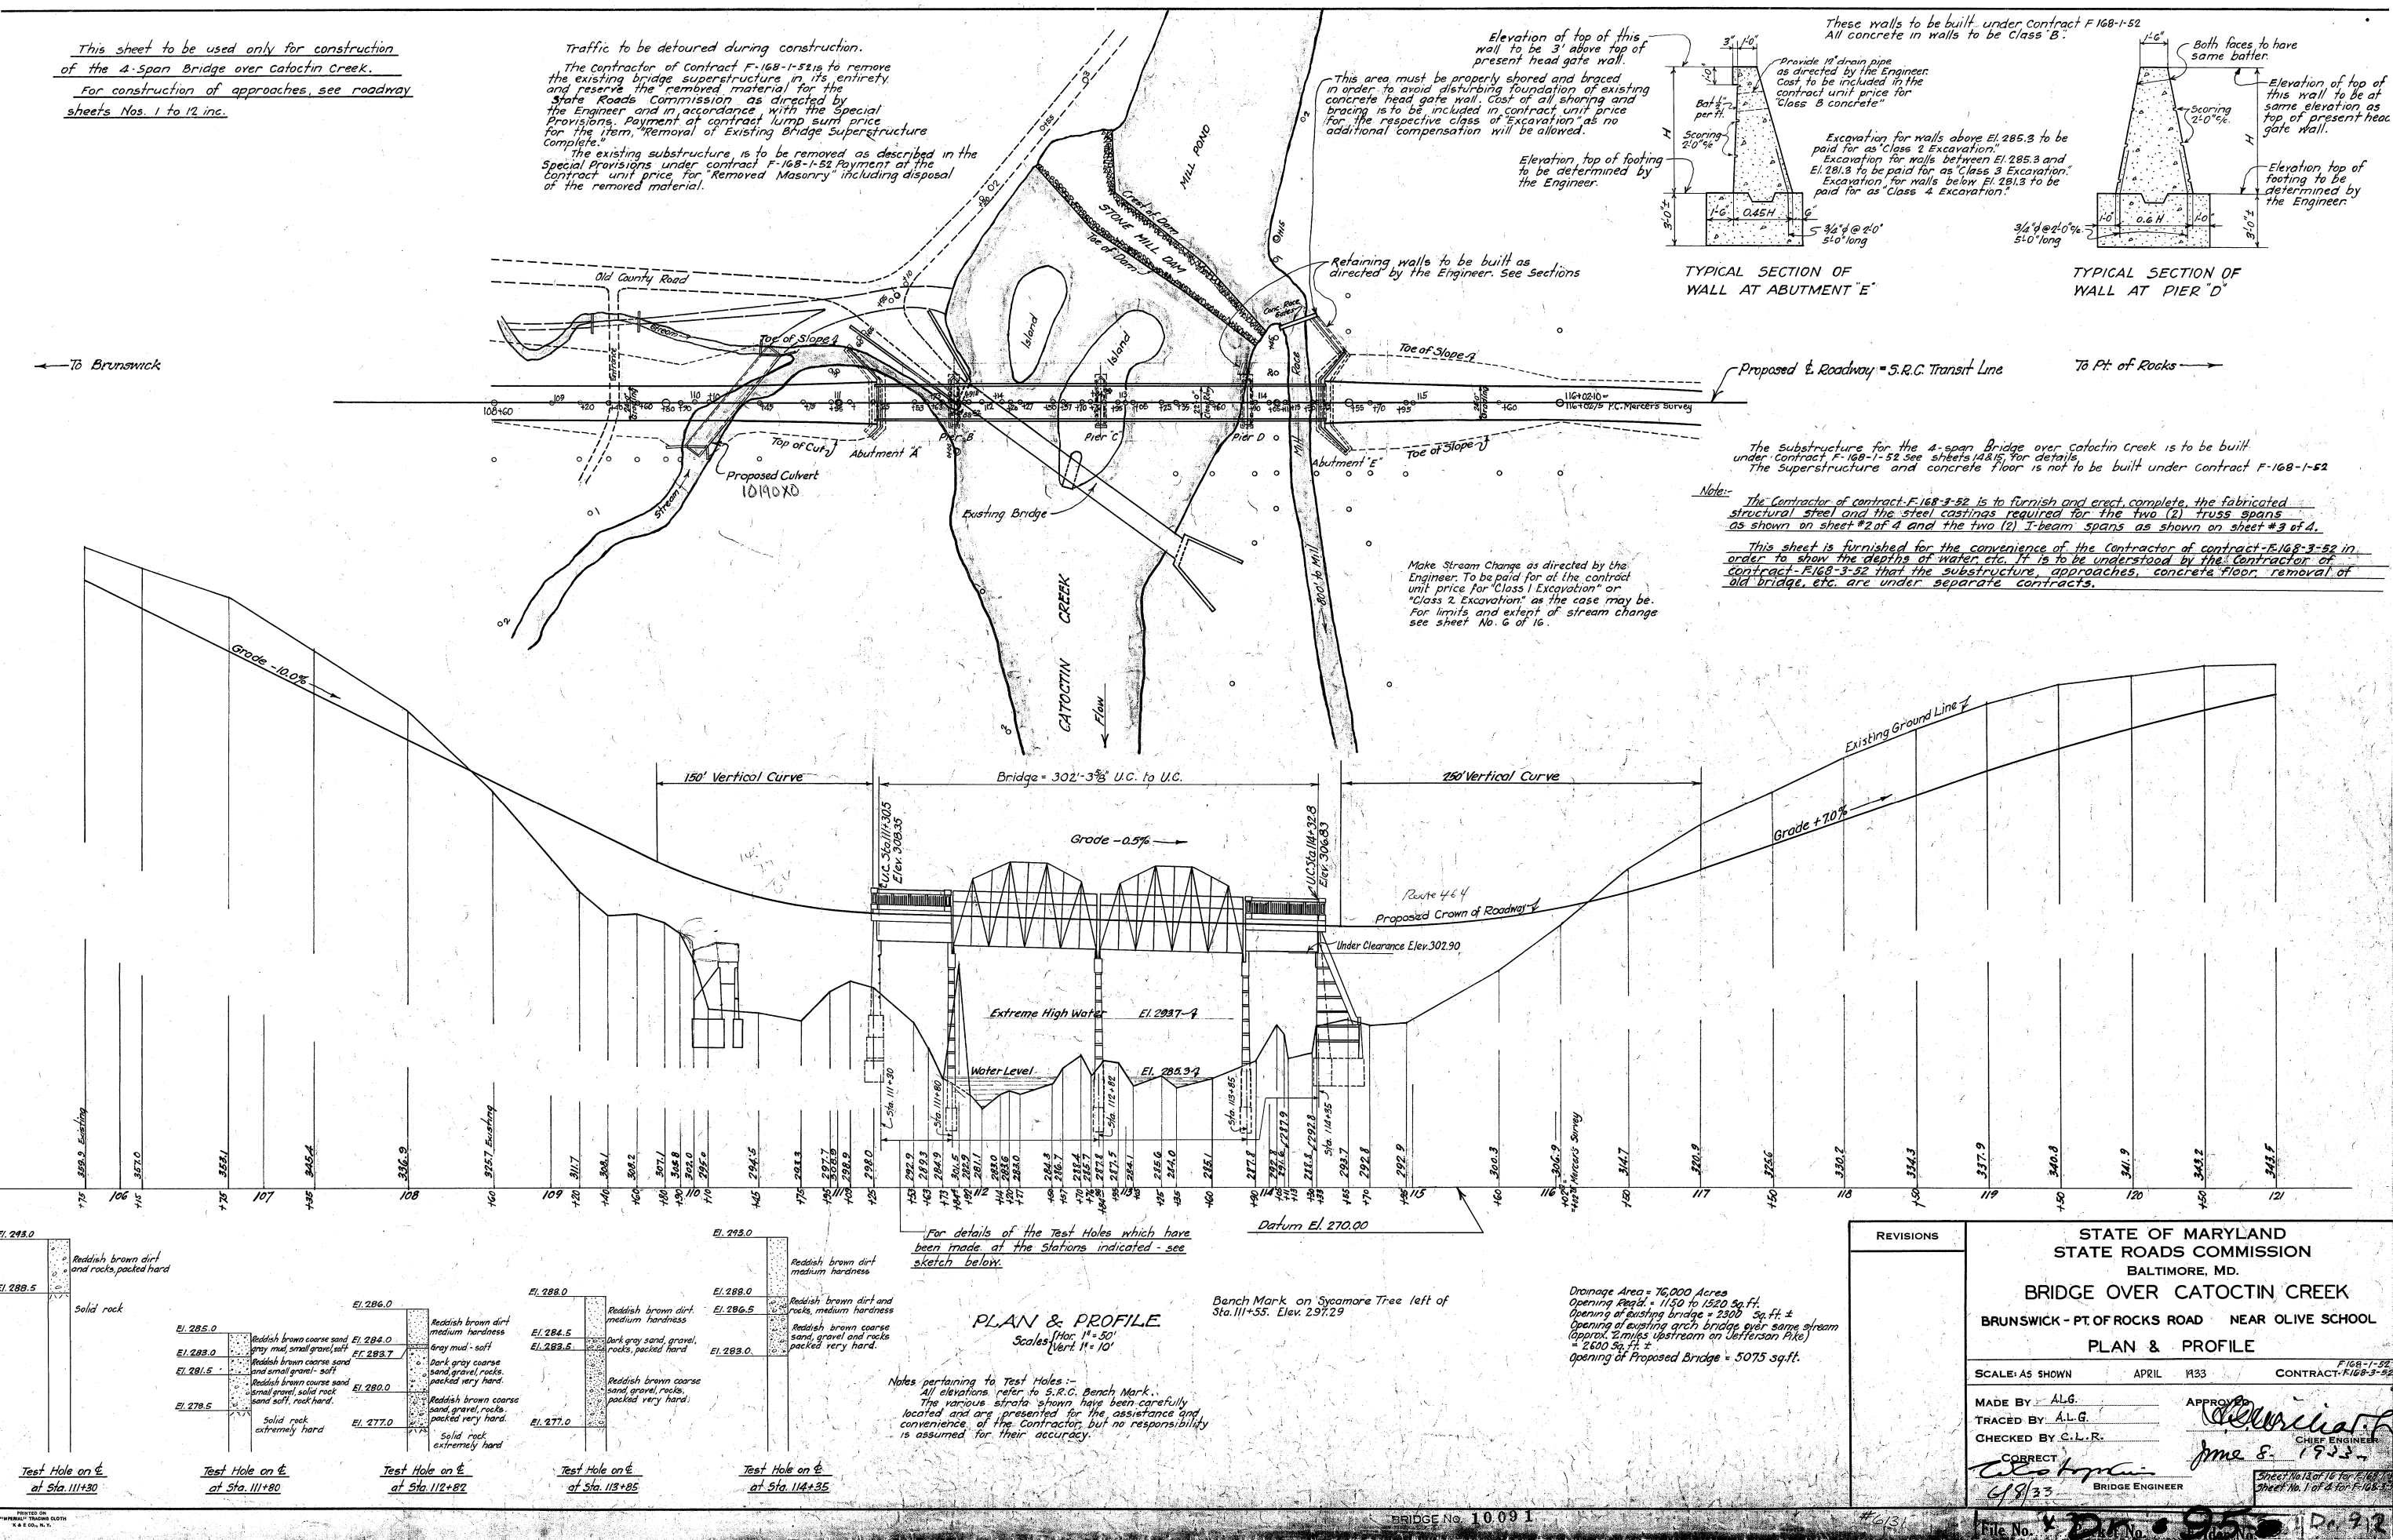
1933 Plan and Cross Section Views of Current MD Route 464 Bridge Over Catoctin Creek.
